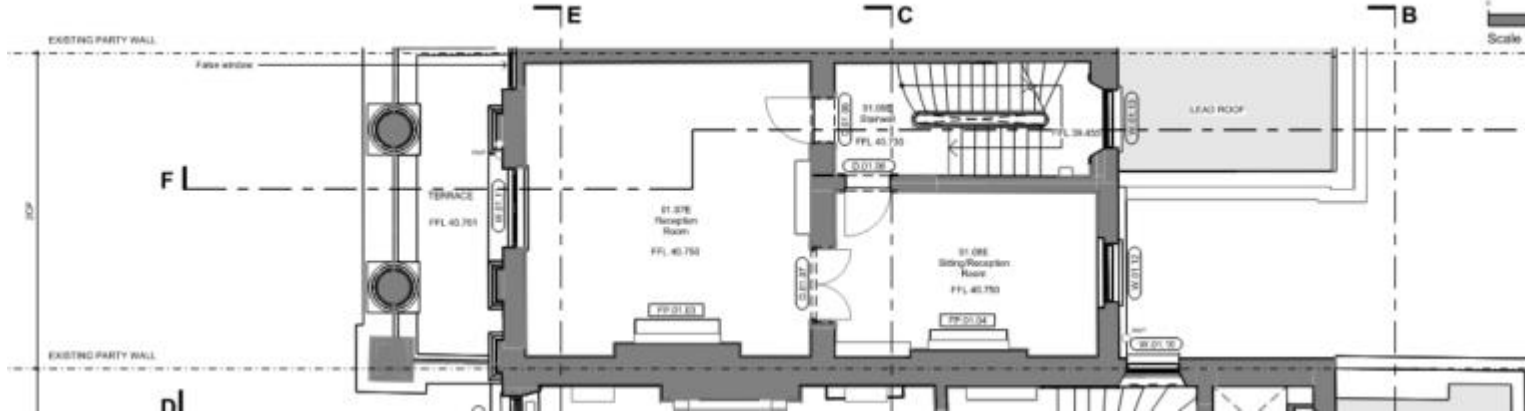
Extract from existing 1<sup>st</sup> floor plan (above)
